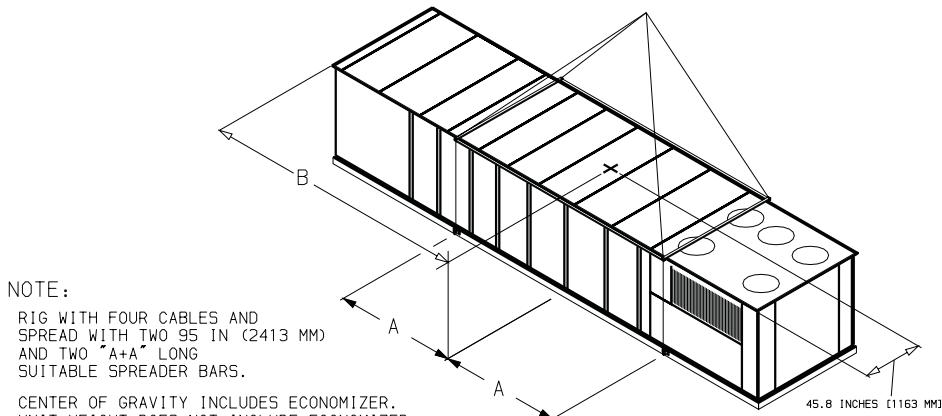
Rigging Label — Size 055-105 Units (Standard Chassis)
